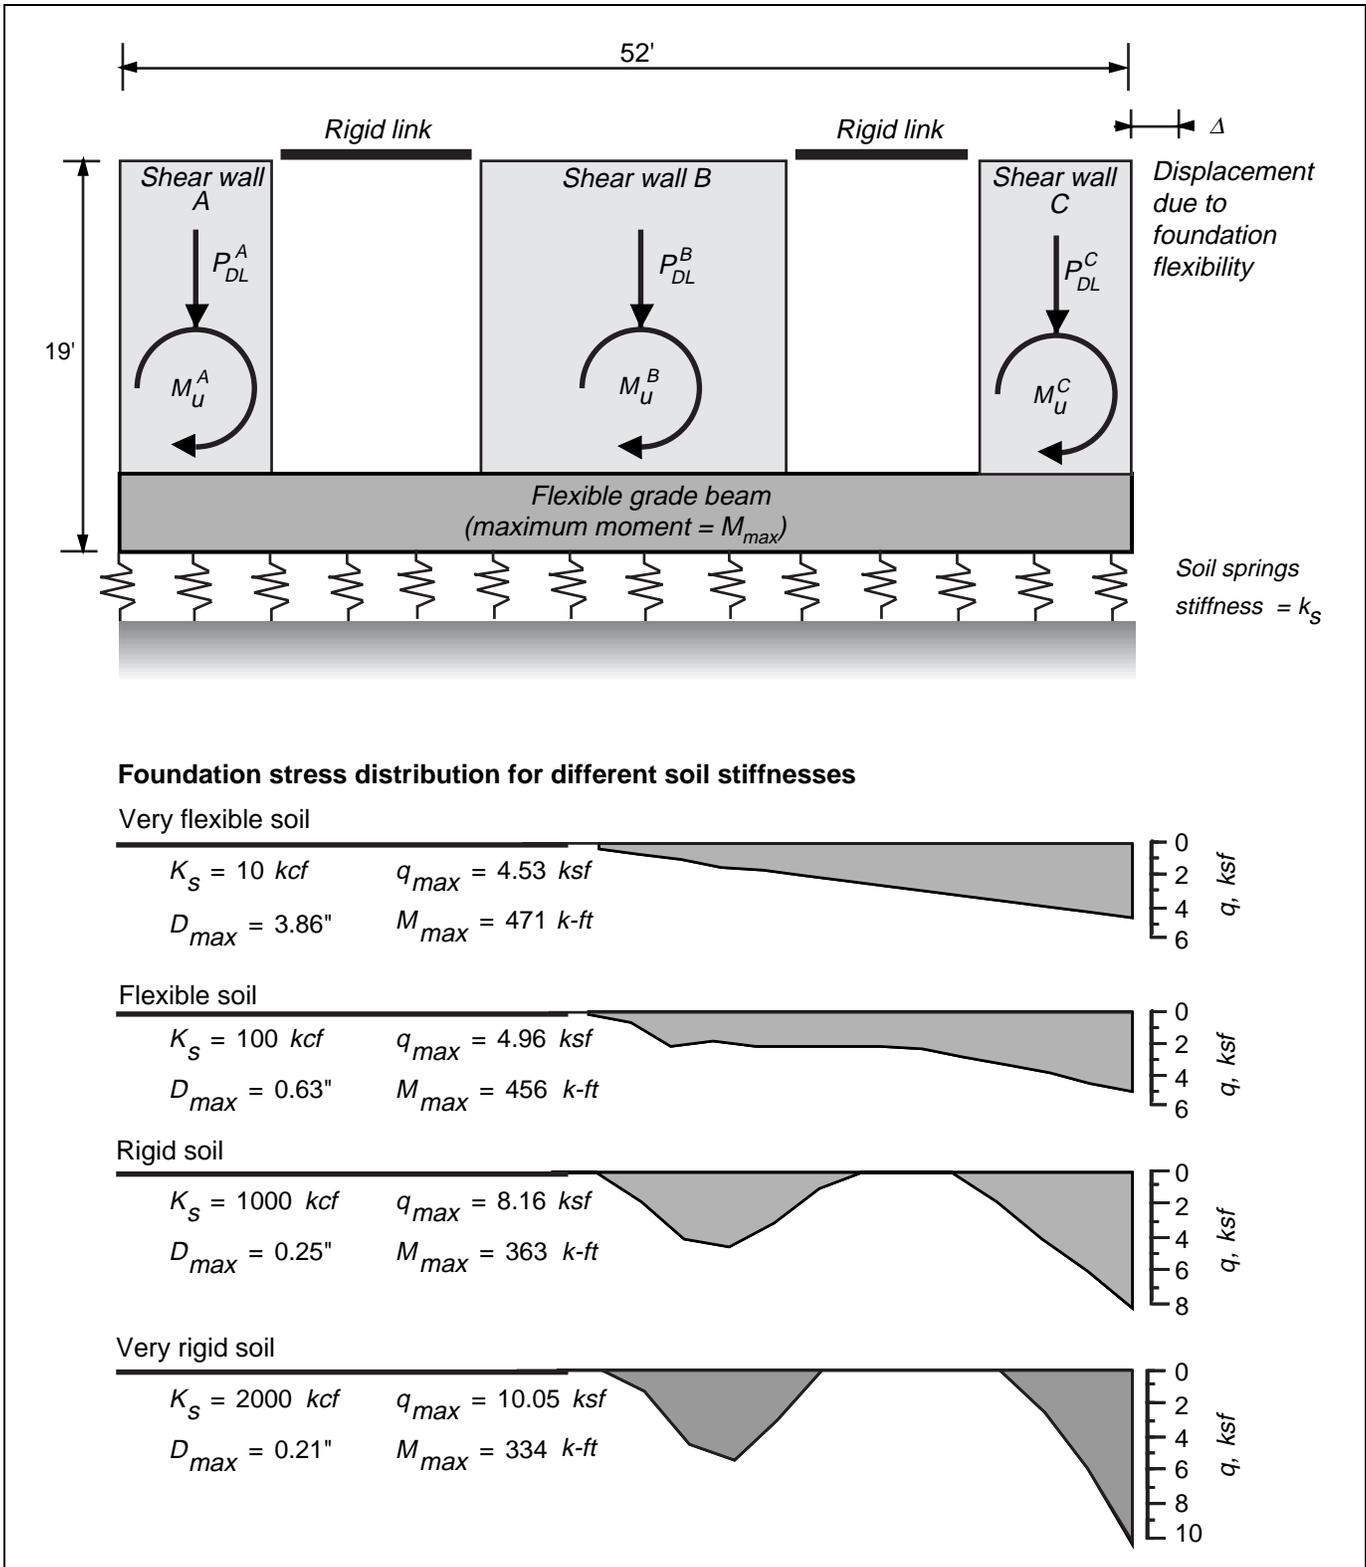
Structural Model, One Exterior Wall of Two-Story Masonry Building
